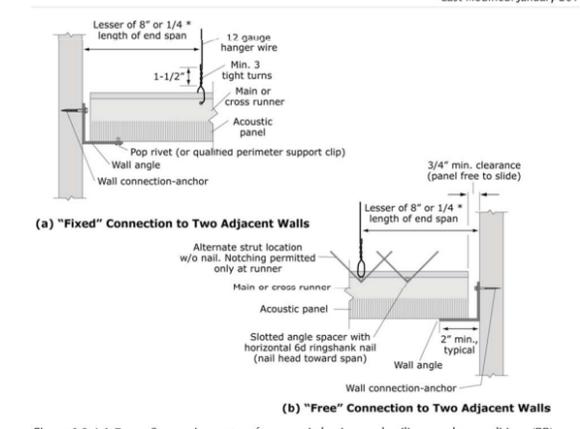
Suspension system for acoustic lay-in panel ceilings - edge conditions (PR).
